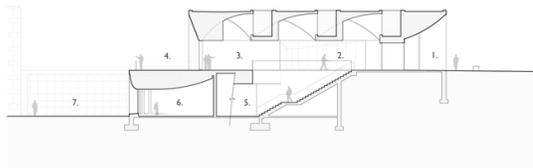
Lakewood Mausoleum drawings. (Archdaily)
